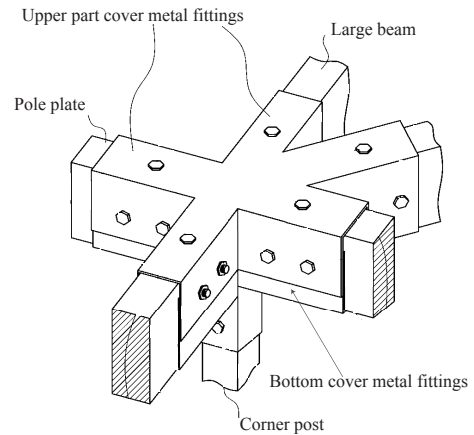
Cross-like reinforcement metal fittings (eaves corner perspective diagram)
